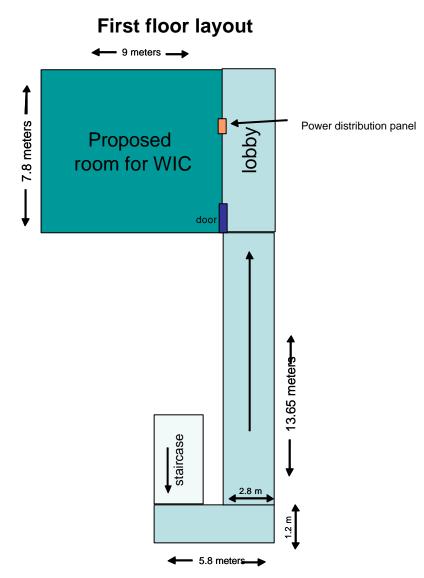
Layout of Meerut cold store facility (first floor) and suggested locations for the new WIC
